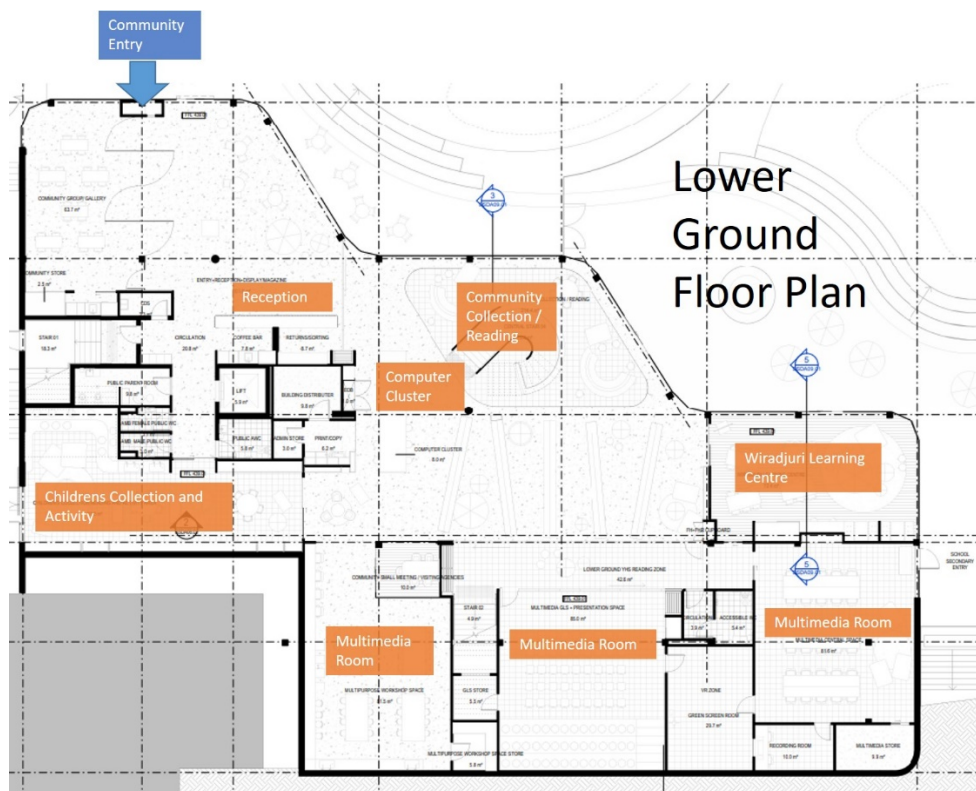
| New Library lower ground floor plan (Source: Applicant's EIS 2019)
